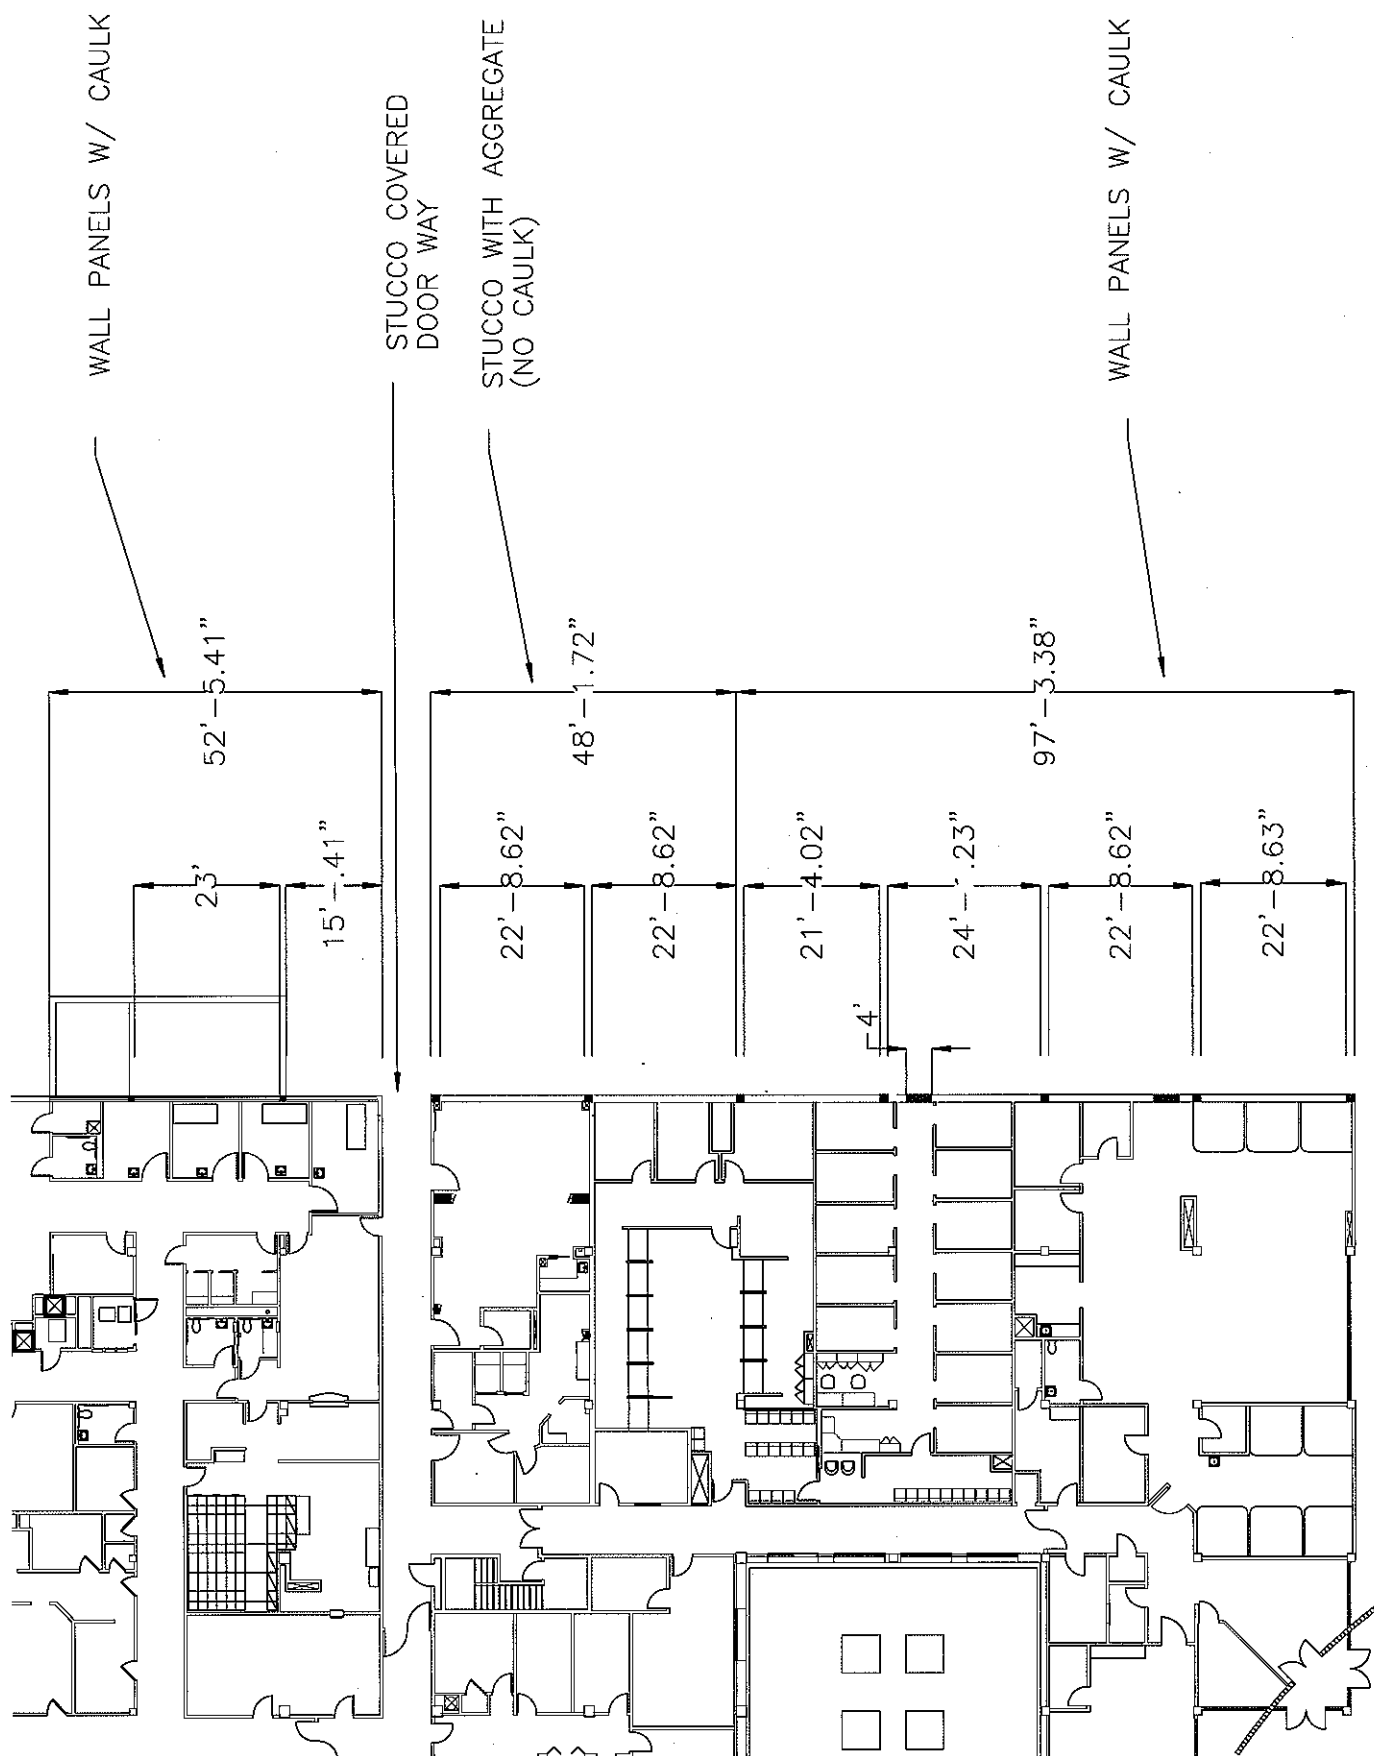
CONSTRUCTION OF CONTAINMENT UNIT SOUTH WALL
